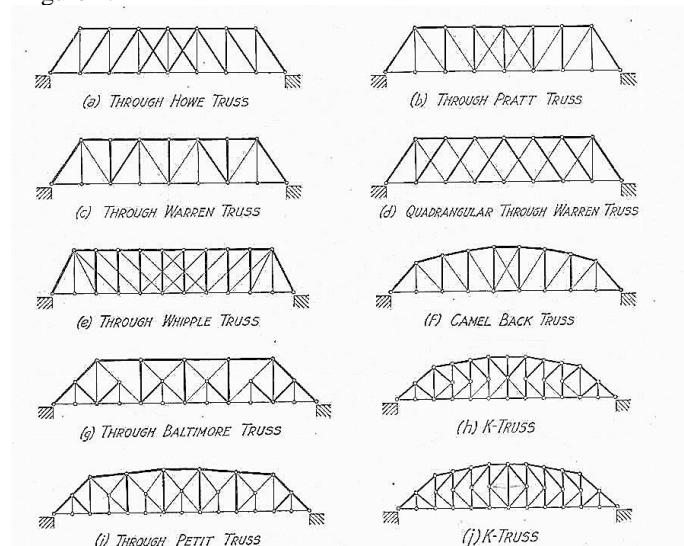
Types of truss bridge (Source: Milo S, 1920)
